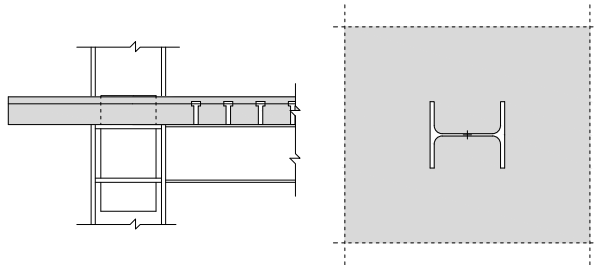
Typical steel-concrete compound joint (slab in contact with the column).
